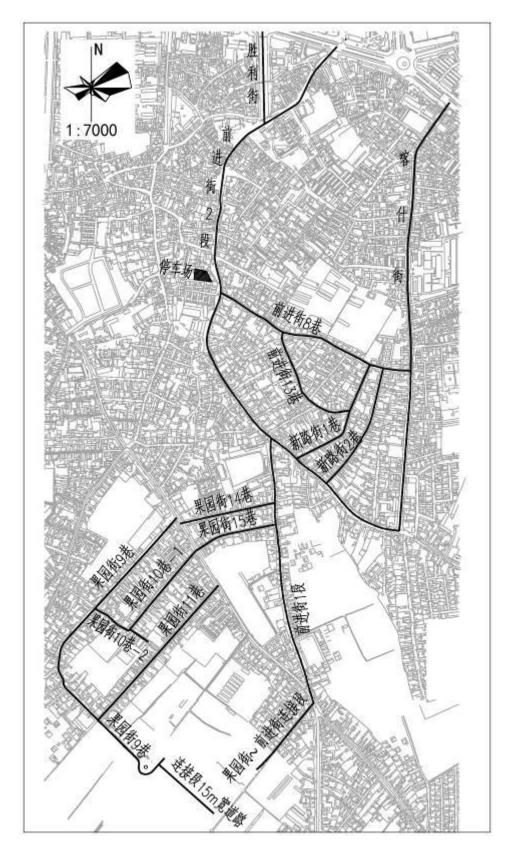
(c) Alleys reconstruction general layout in kazanqi area
